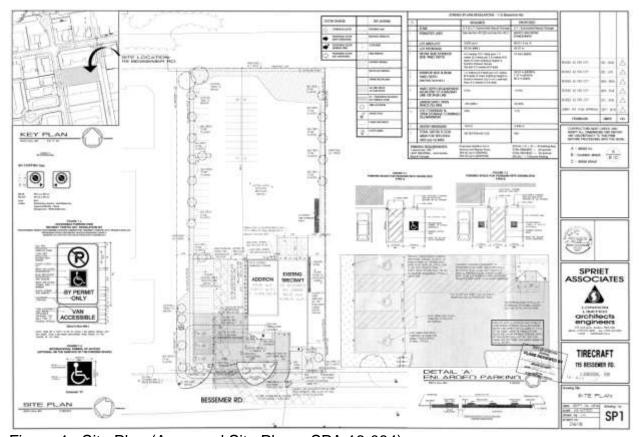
Site Plan (Approved Site Plan – SPA 16-084)
